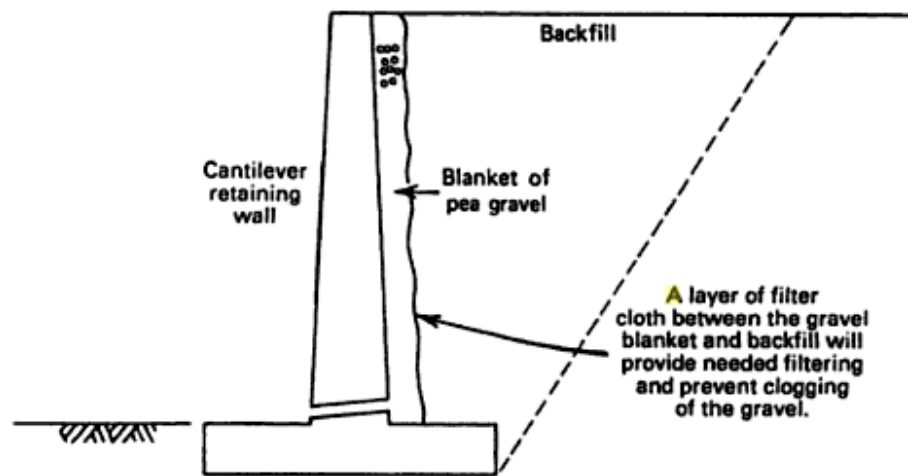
Retaining Wall Drainage System (Ahlvín, 1988)
